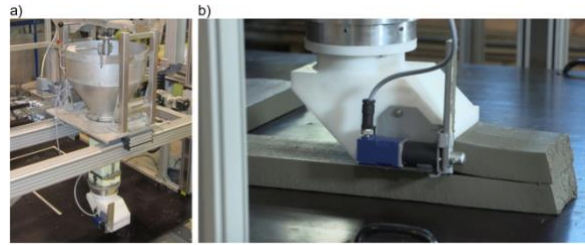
(a) Industrial robot for small structures (b) printing nozzle [5].
